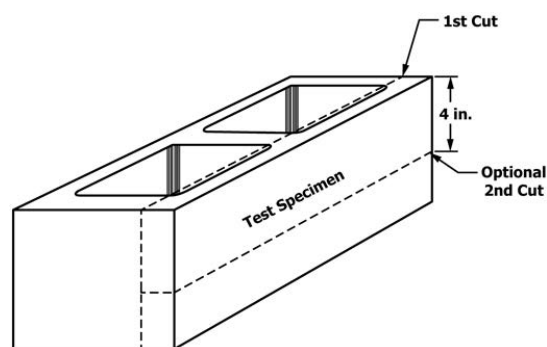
View of Sawed Block Showing a Suggested Sequence of Cuts and Location of Half-Face Shell Specimens
